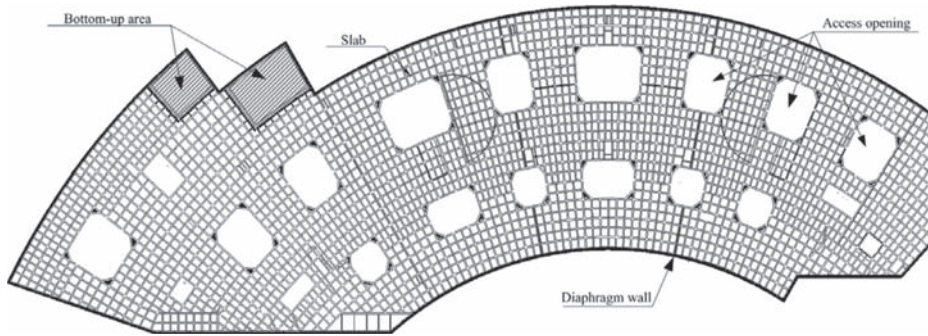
Plan view of the structure of the roof slab and distribution of access openings.
